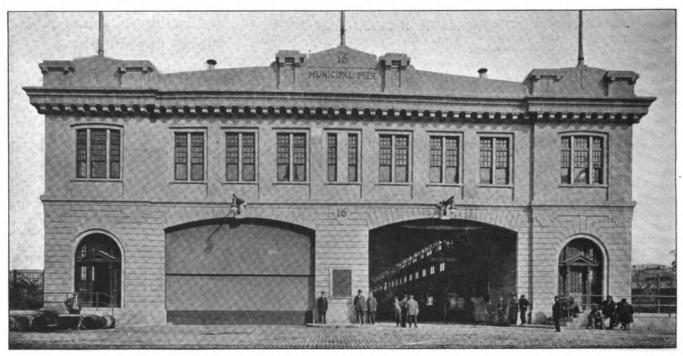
FRONT VIEW OF NEW DOCK STREET PIER
